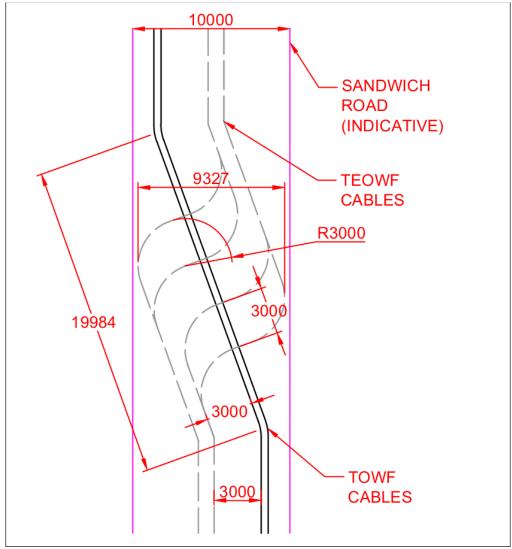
Indicative plan arrangement of TOWF Crossing 1 [6]
